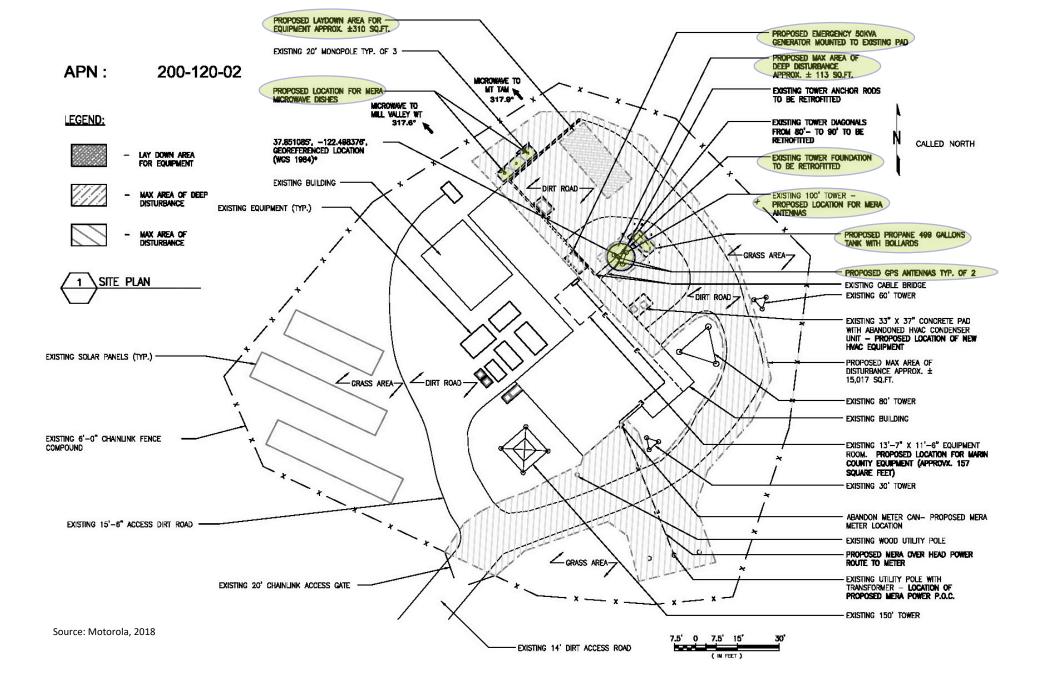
Site 24 - Wolfback Ridge Site Plan
